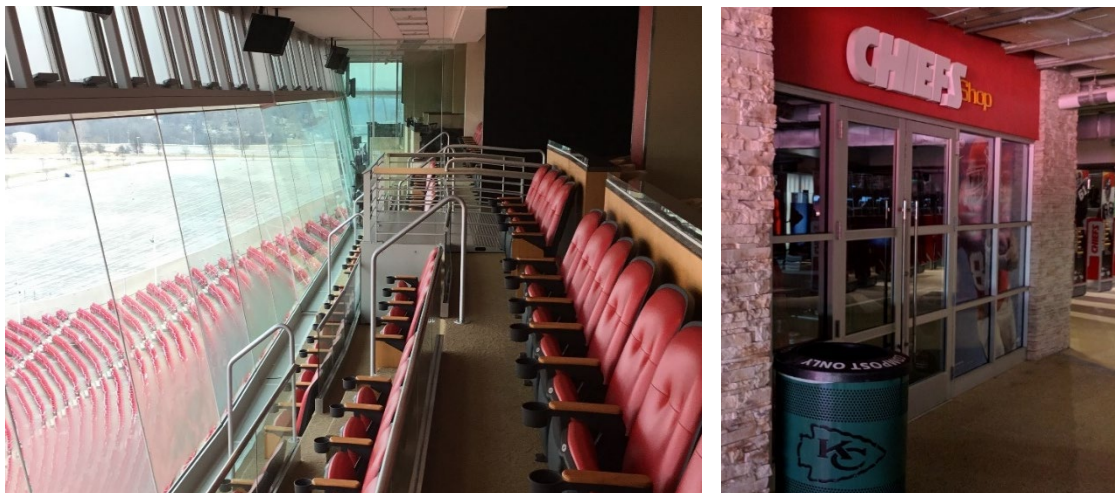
Windows, Storefront, and Sliding Glass Wall System
